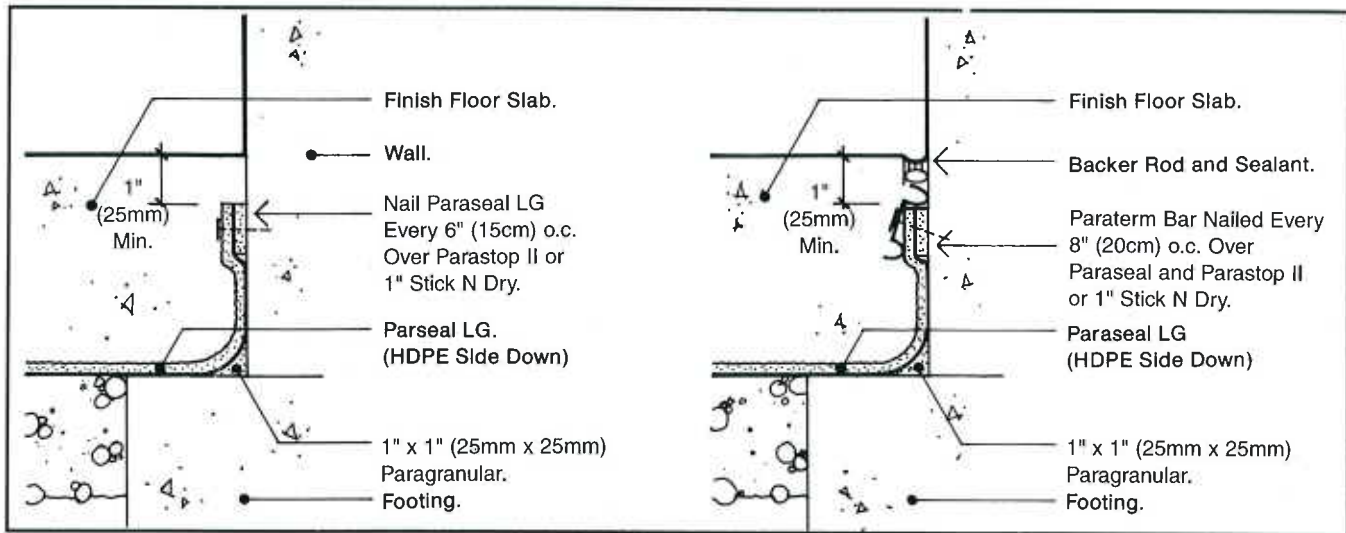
Tie-In Between Blindside Wall and Mat Slab/Protection Slab.
